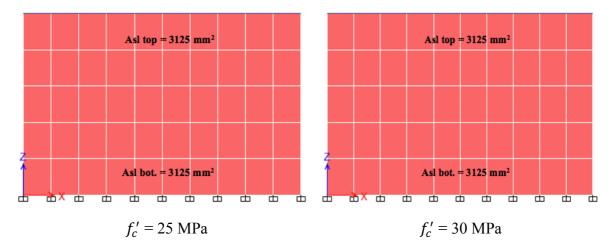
17: The effect of compressive strength of concrete on the steel reinforcement of shear walls
